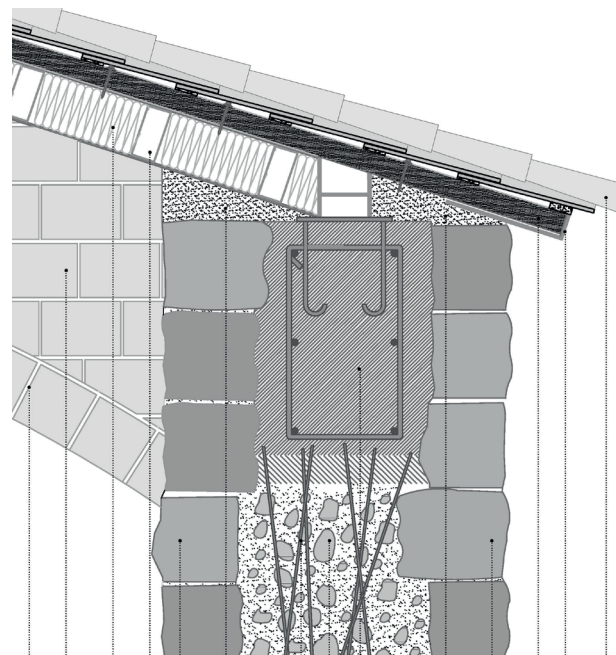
Proposal for intervention with brick partition, horizontal beams, and reinforced concrete perimeter band (Rosado 2017).
